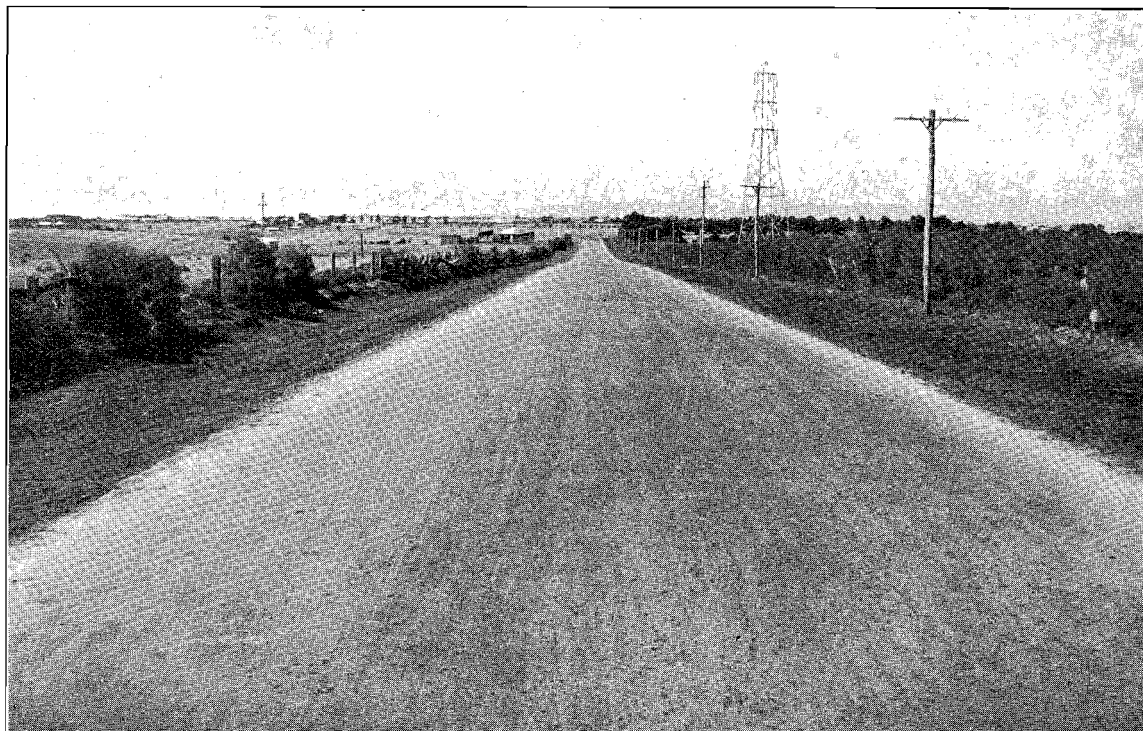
Reconstructed section of North-Western Highway between Melbourne and Keilor.
